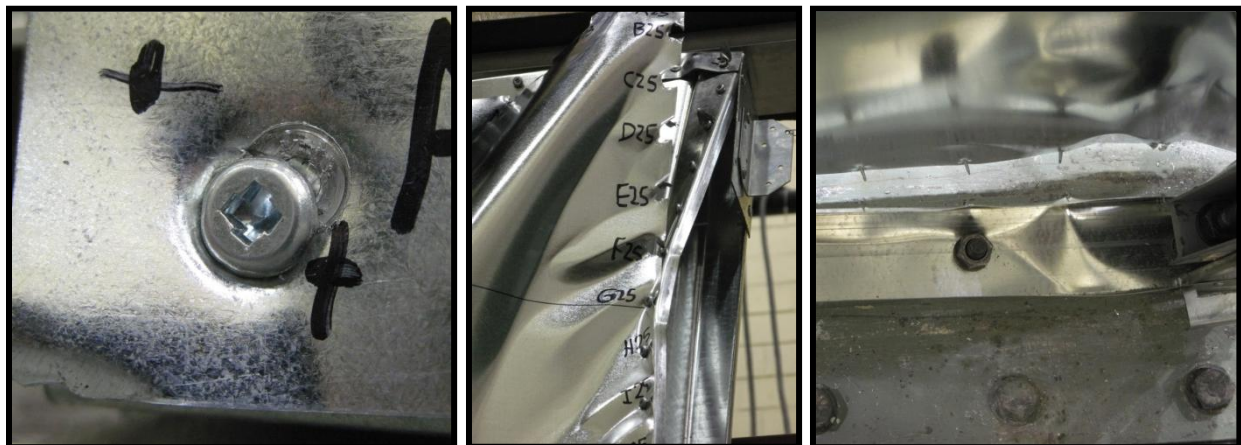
Shear wall test specimens showing bearing damage at screw connections, as well as chord stud twisting and track uplift caused by tension field forces.
